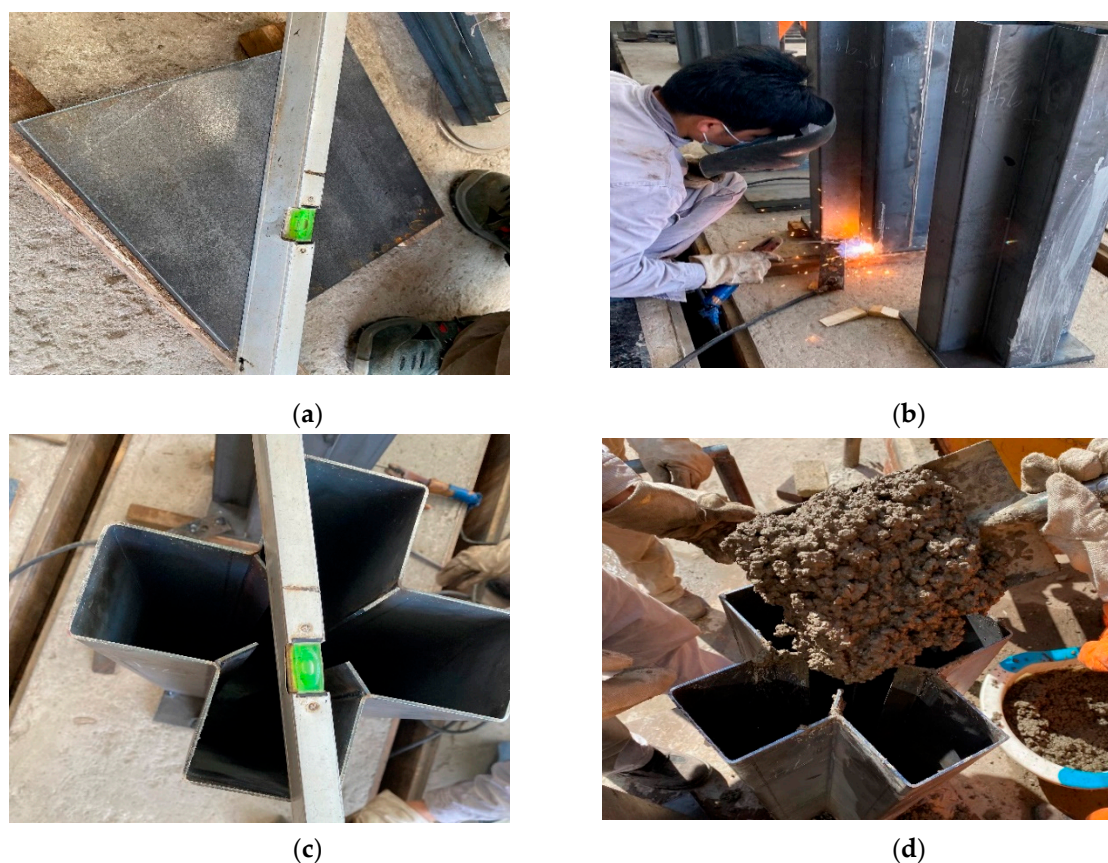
Specimen before and during concrete pouring: (a) Loading plate leveling; (b) Loading plate welding with the specimen; (c) Levelling the specimen; (d) Concrete pouring.
